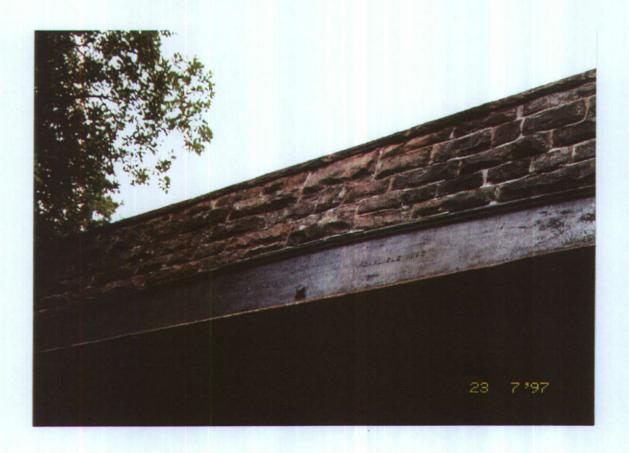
OUTSIDE FACE OF EAST PARAPET
